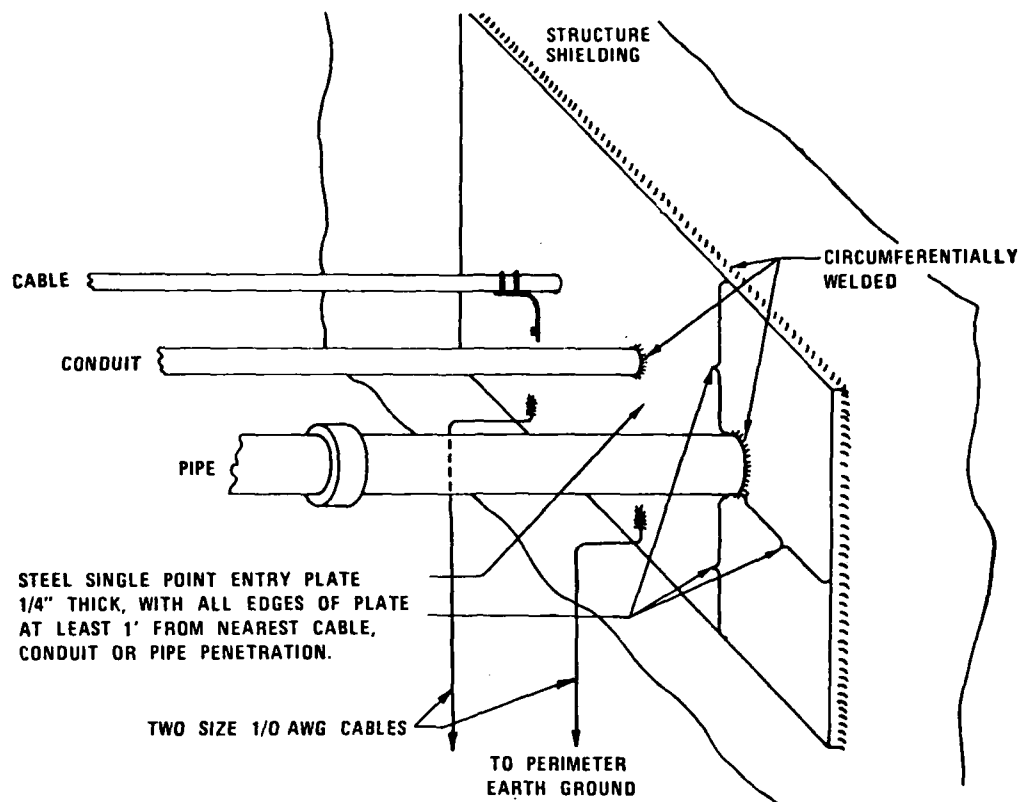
Typical Entry Plate Showing Rigid Cable, Conduit, and Pipe Penetrations
